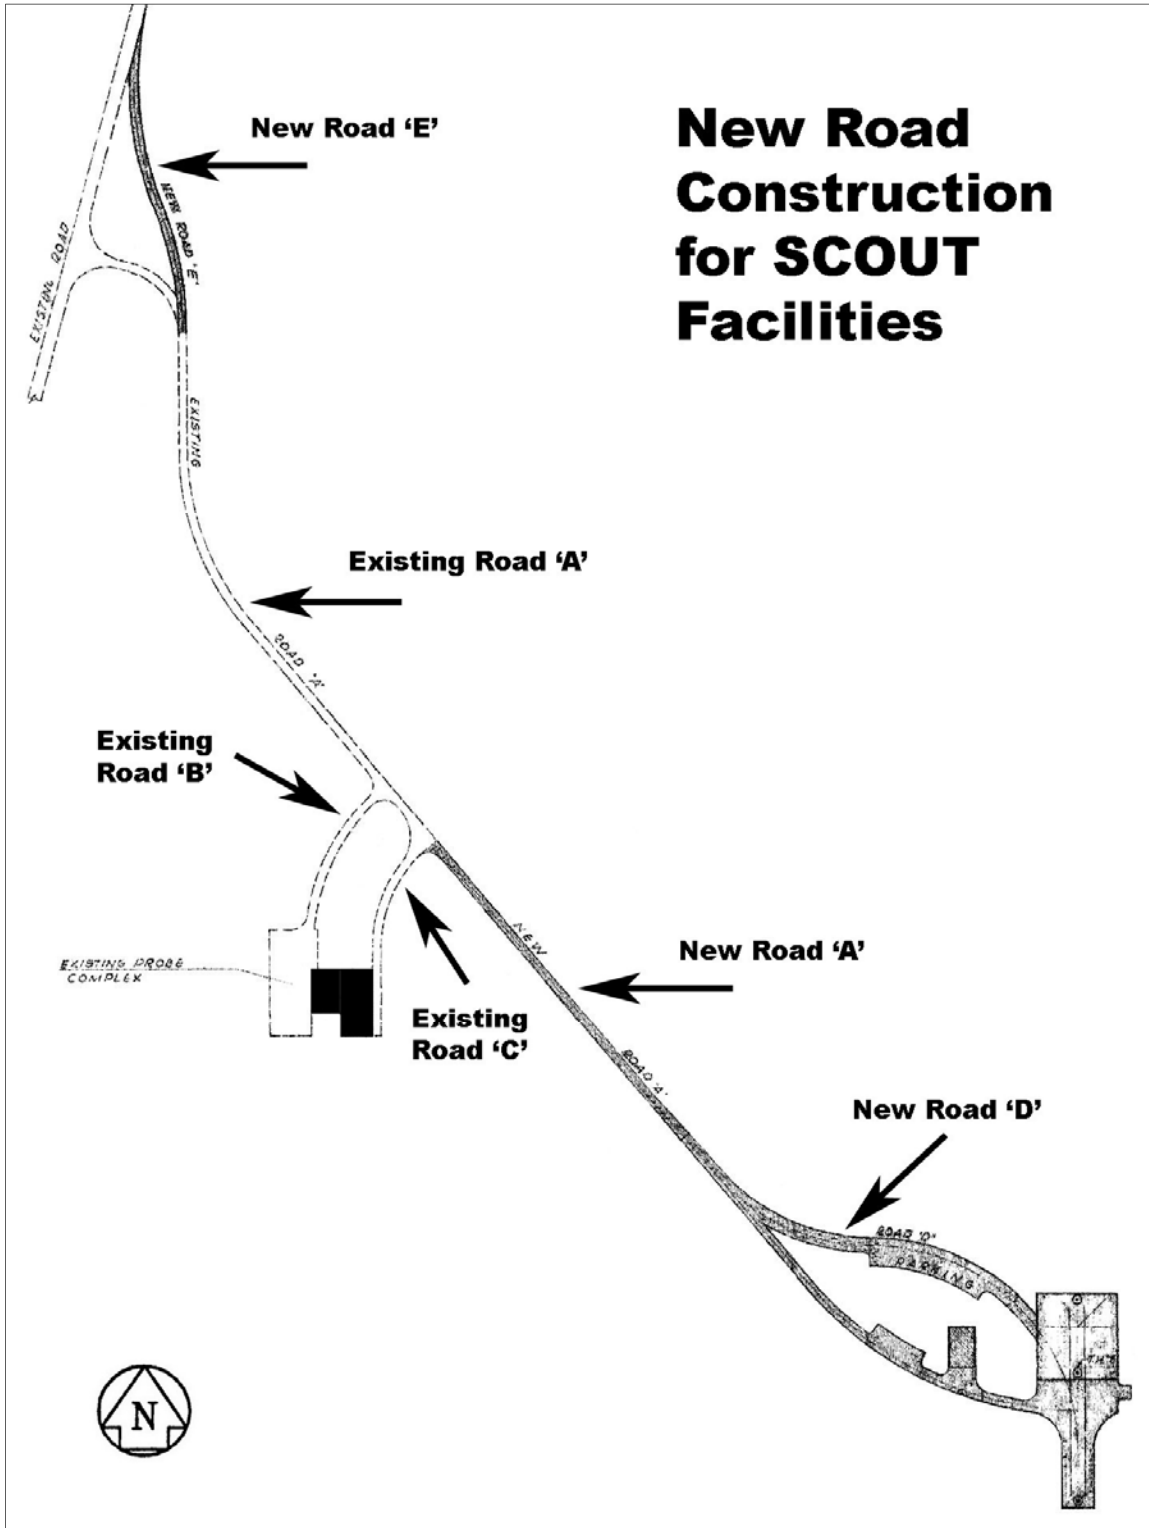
New road construction for Scout facilities (produced by ERDC-CERL).
